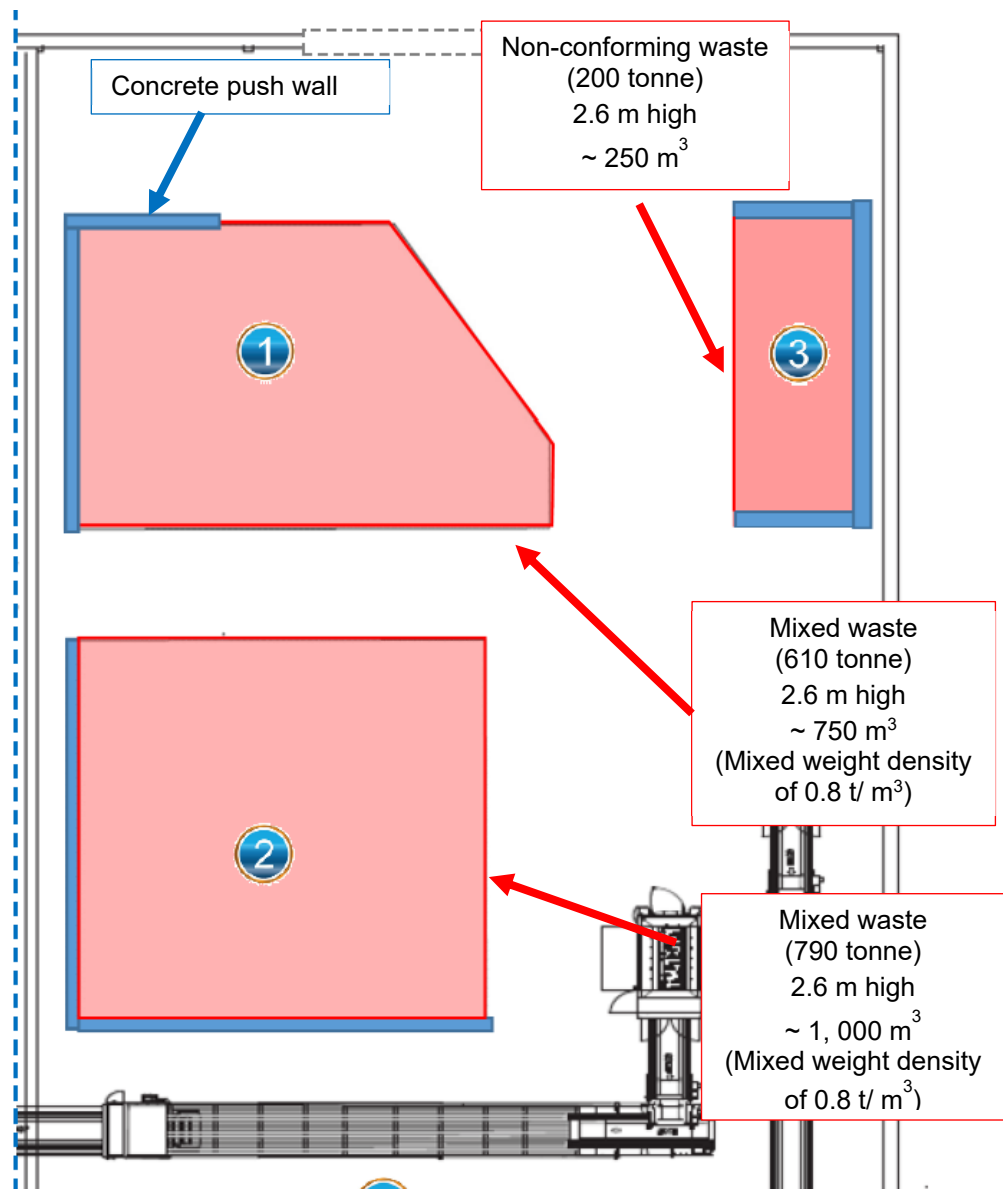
Internal Stockpiles and Indicative Push Walls for Waste Reception Hall
